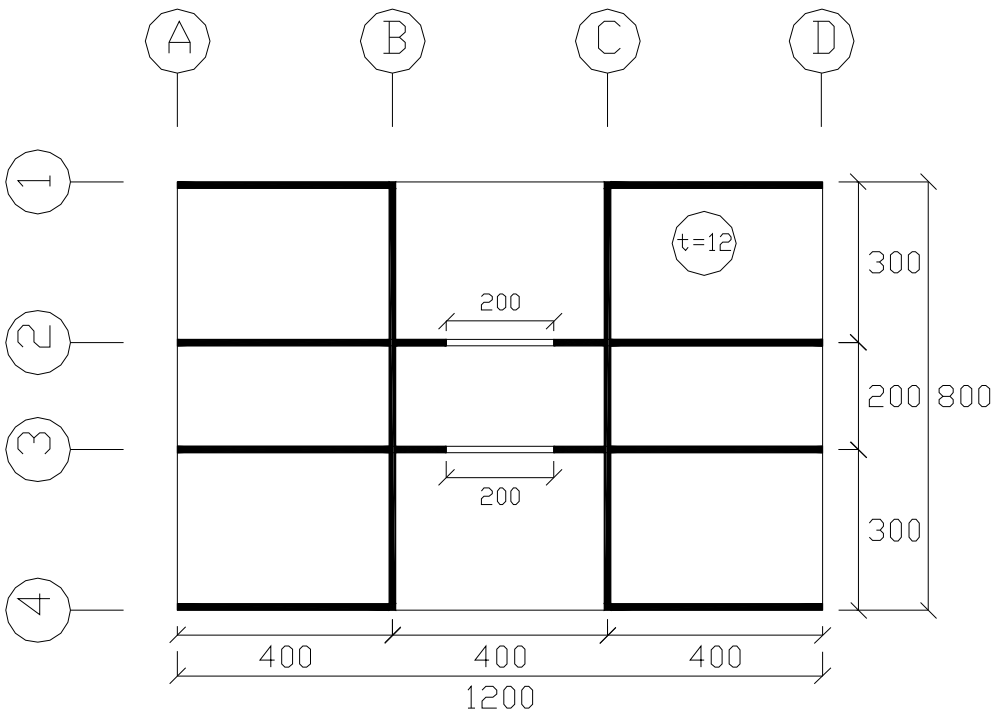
Typical plan view – Plan No. 9 (units in cm)
